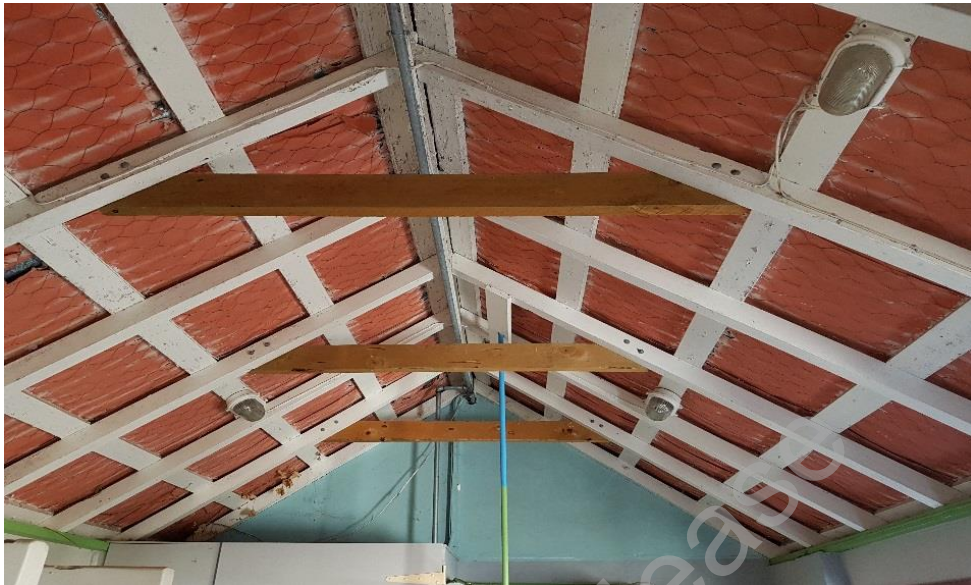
Timber framed structure in the wash/shower block (Building 6) with timber ties across the main rafters.
